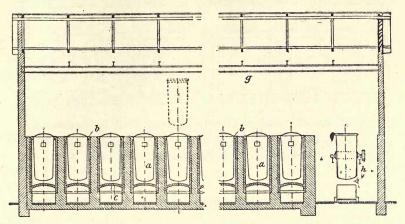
Longitudinal Section of a Modern Charring Plant with Vertical Retorts.
